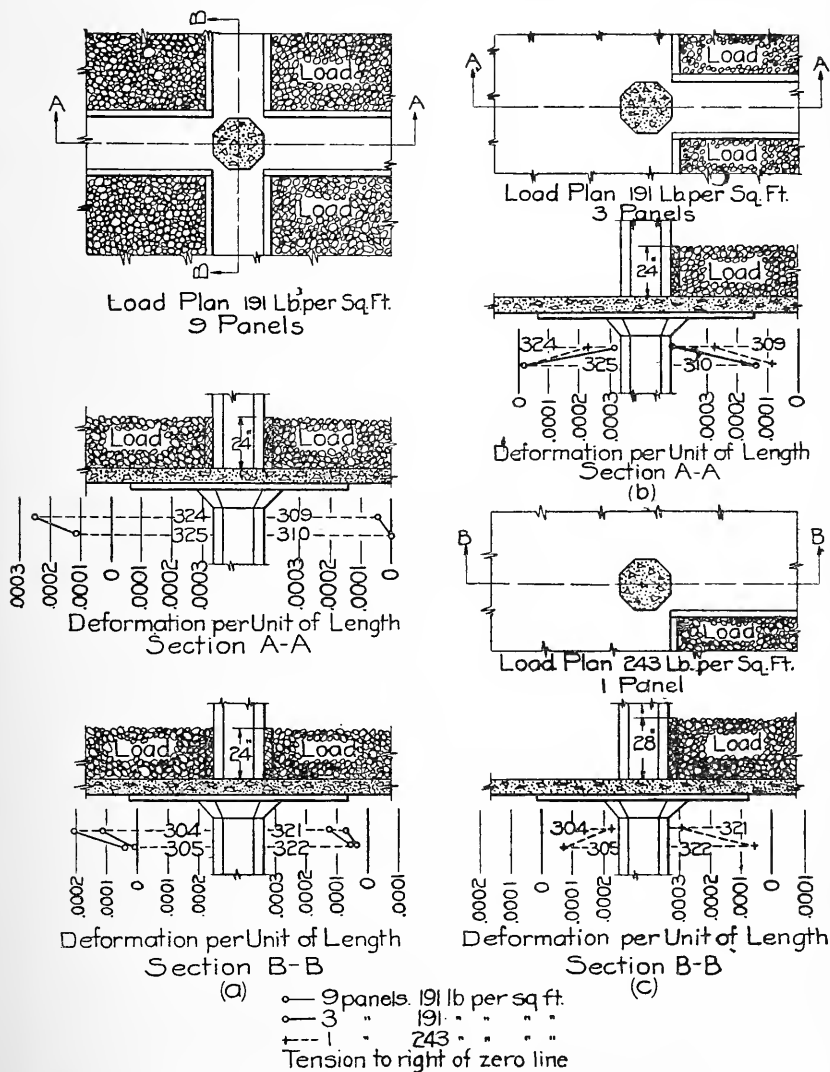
DEFORMATIONS IN INTERIOR COLUMN NO. 68 OF SHREDDED WHEAT FACTORY.
